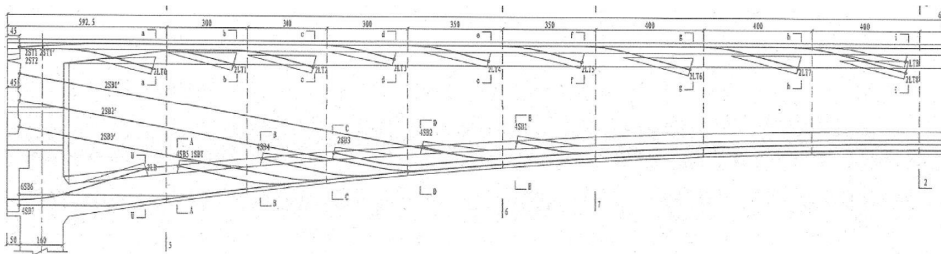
Layout diagram of prestressed steel tendons for cantilever casting segments of junction piers.
